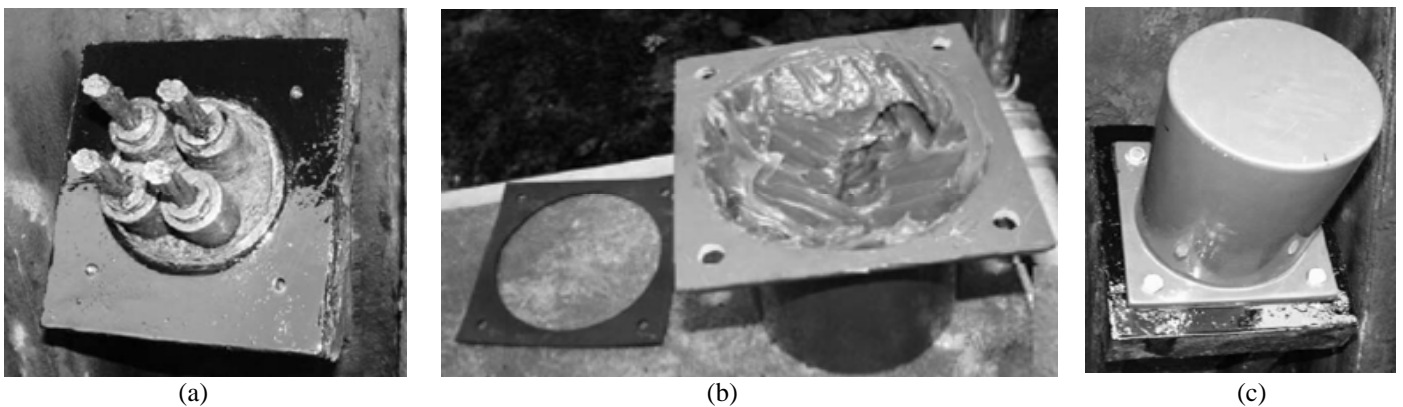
(a) Main anchor head lock off (wedges) and bituminous coated bearing plate (b) Grease filled protective cover (c) Assembled anchor head unit (Littlejohn and Mothersille, 2008b; Mothersille, 2006).
